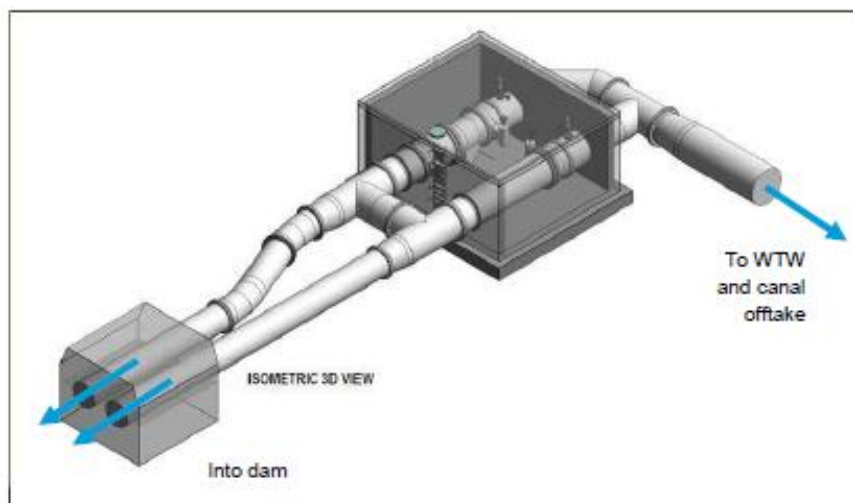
Isometric view of Coerney Dam Inlet/Outlet Chamber (DWS, 2020)
